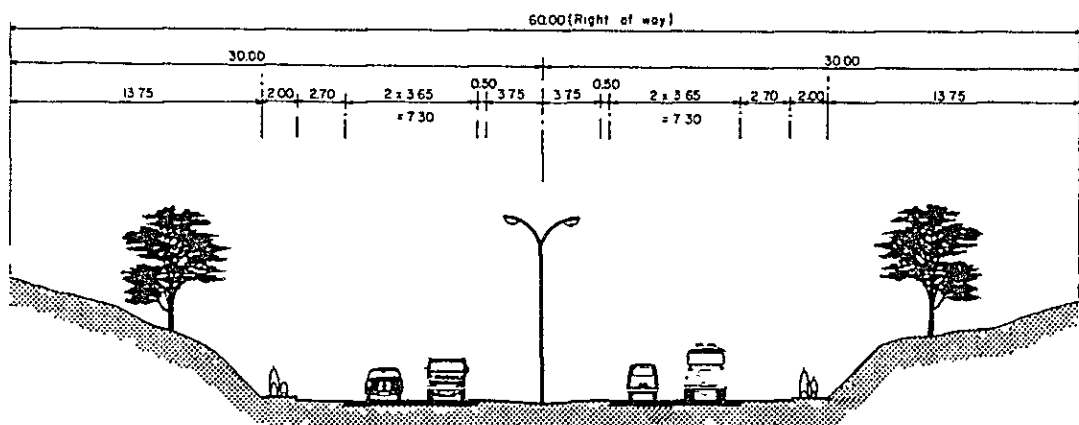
TYPICAL CROSS SECTION OF CORREDOR NORTE
